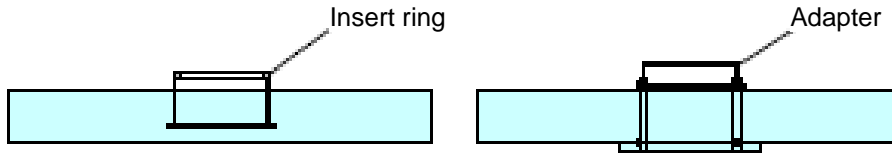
Different types of arrangements for connection of the tower to the foundation, [5].
